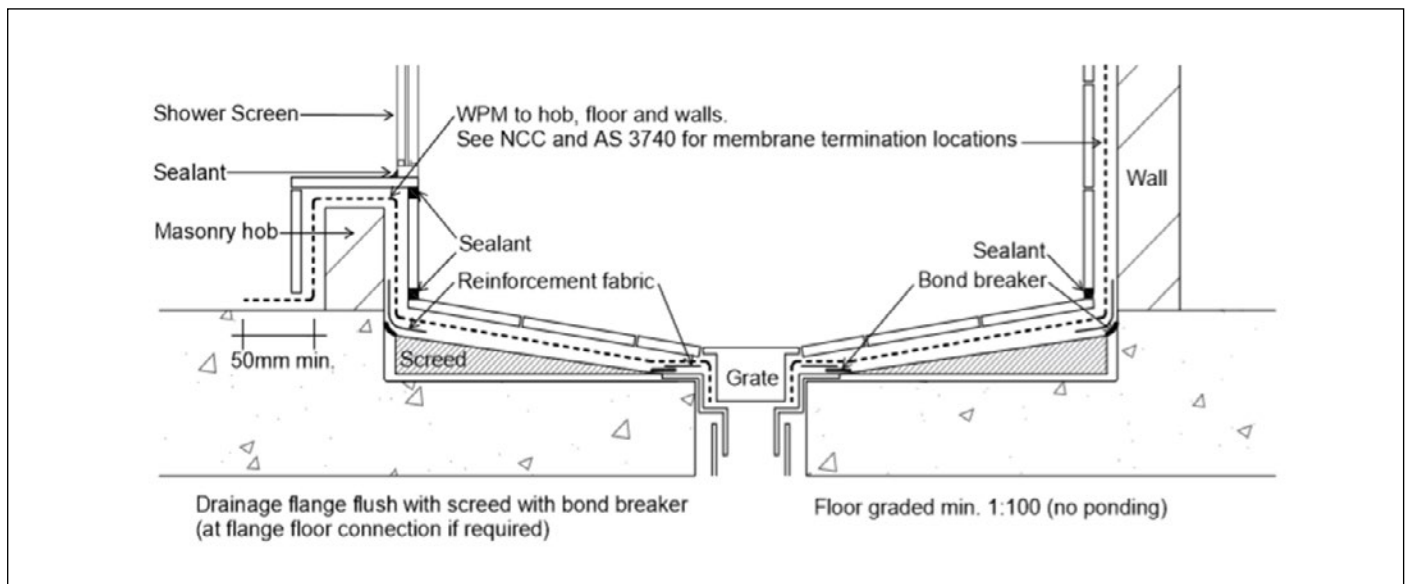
An example of a section through a typical enclosed shower area with hob, on a concrete base.
